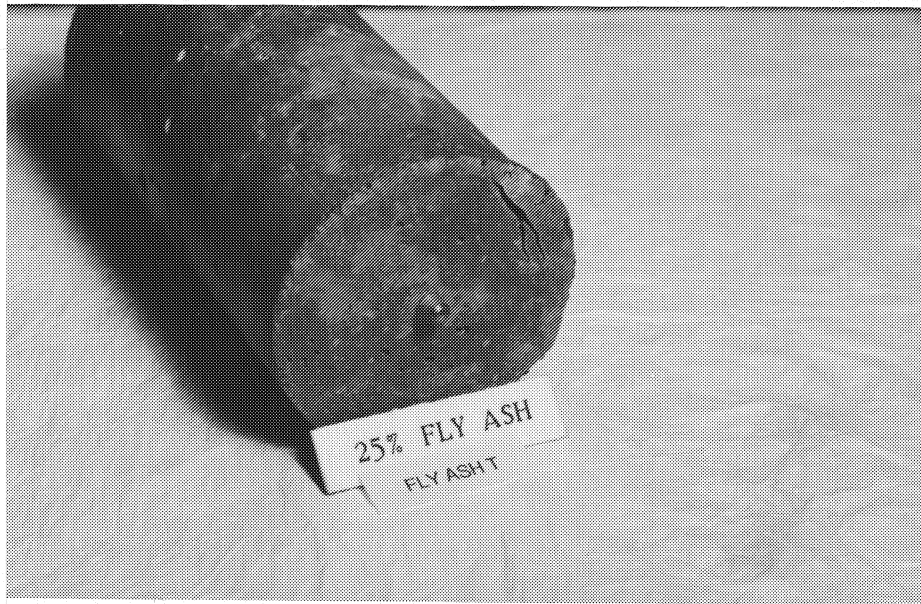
Concrete specimen containing 25% fly ash T at 175 days.
